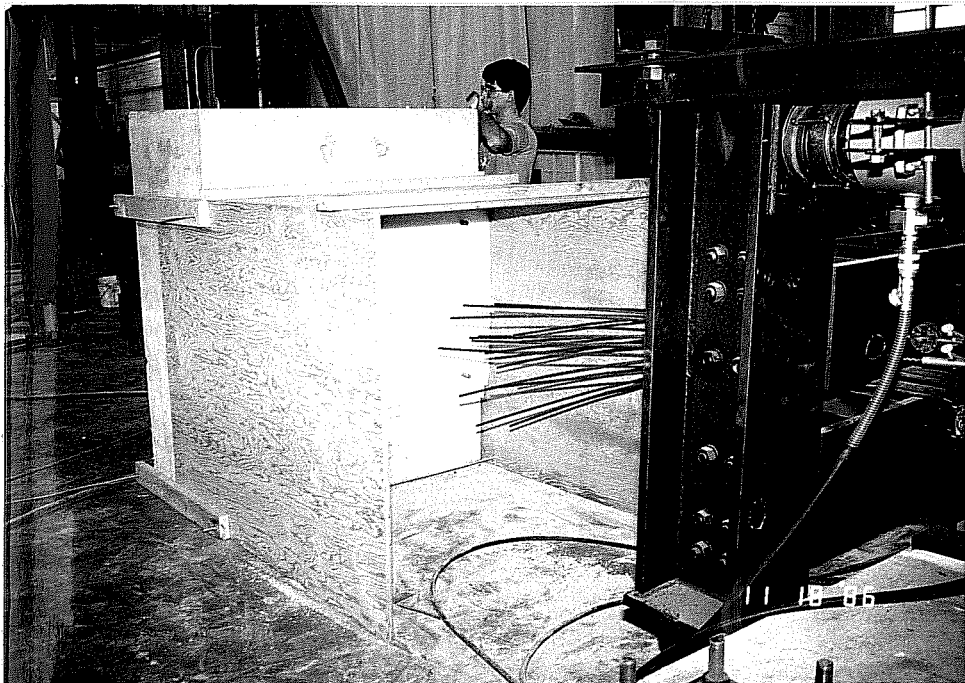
Concrete Safety Barrier with Plywood Containment Box
